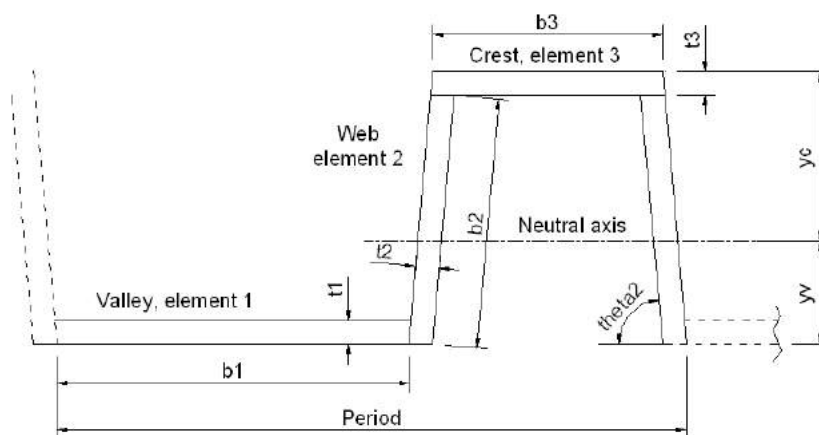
Idealised DC-780 corrugated wall cross-section at crown
